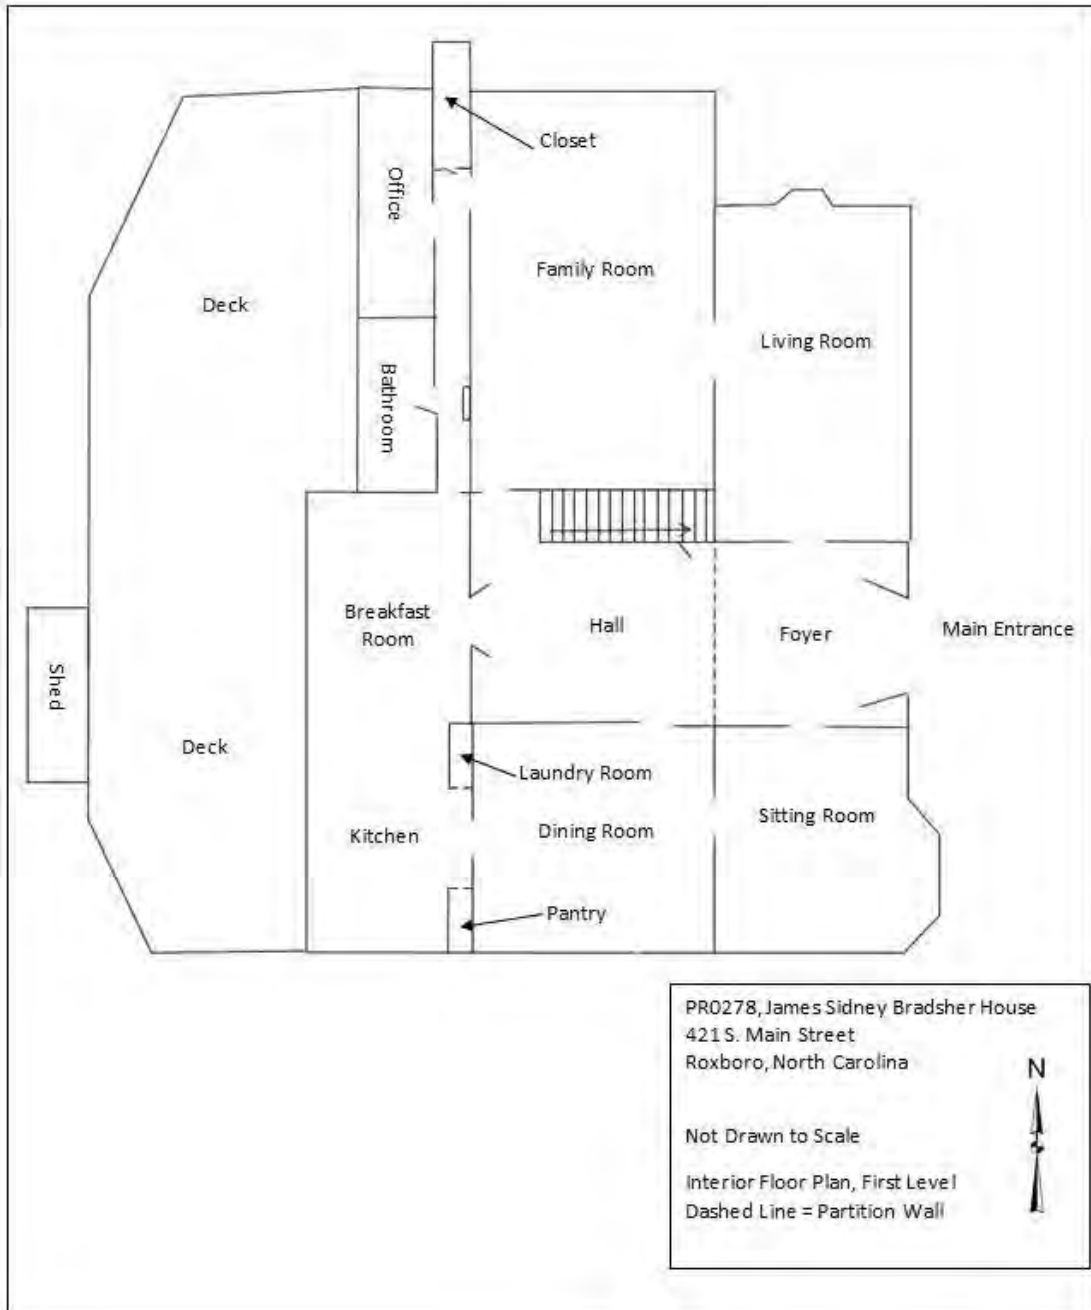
J.S. Bradsher House (PR0278) Interior First Level Floor Plan.
